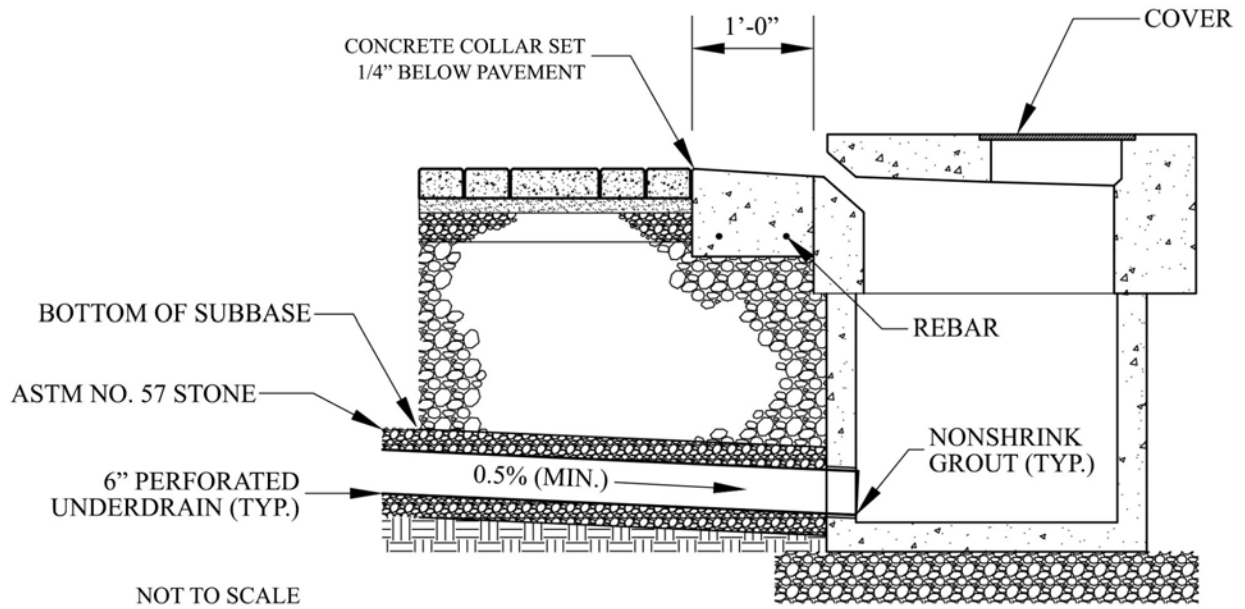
Perforated Underdrain-Sewer Interface Detail, *image by Author.
